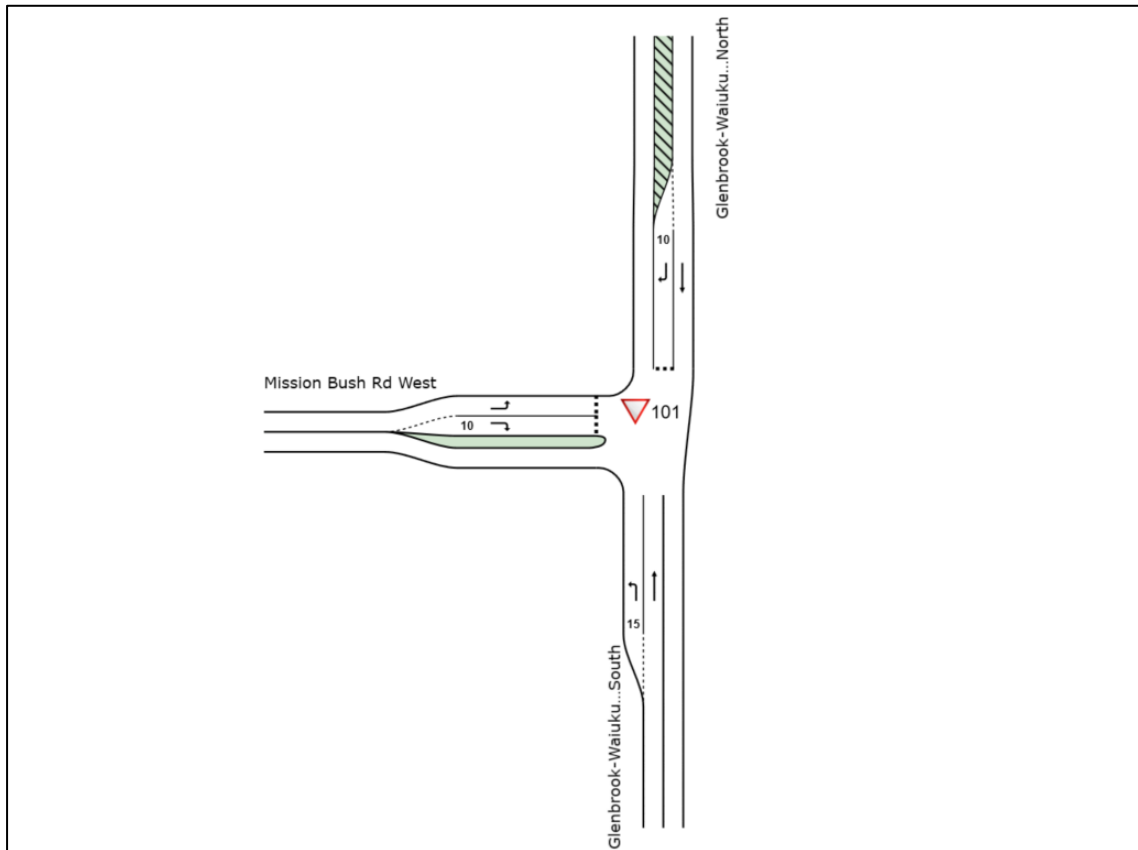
Mission Bush Road / Glenbrook-Waiuku Road Modelling Layout
